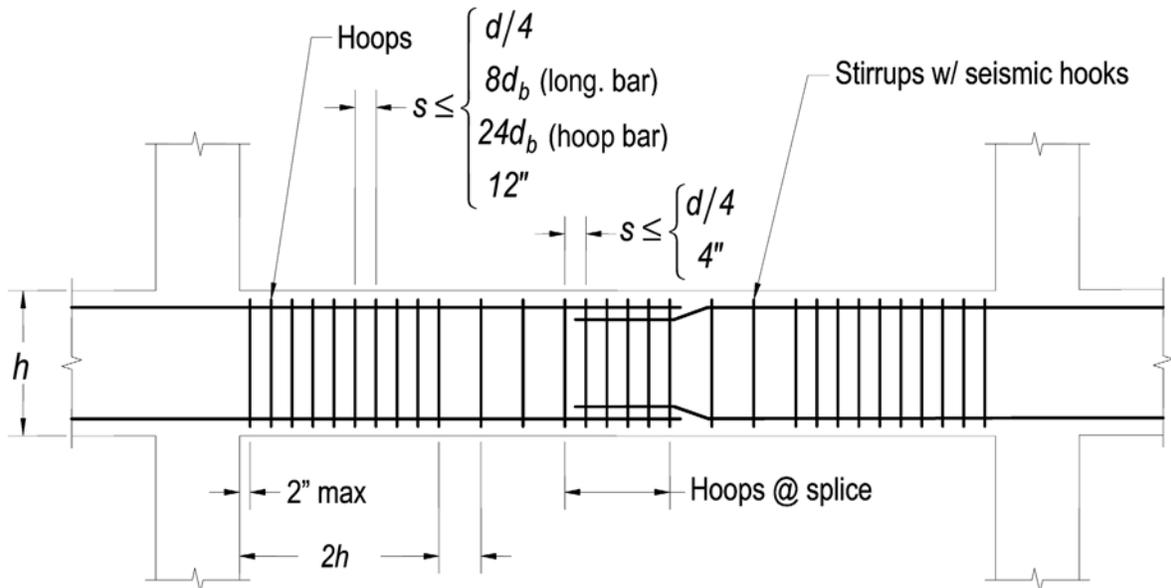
Hoop and stirrup location and spacing requirements.
